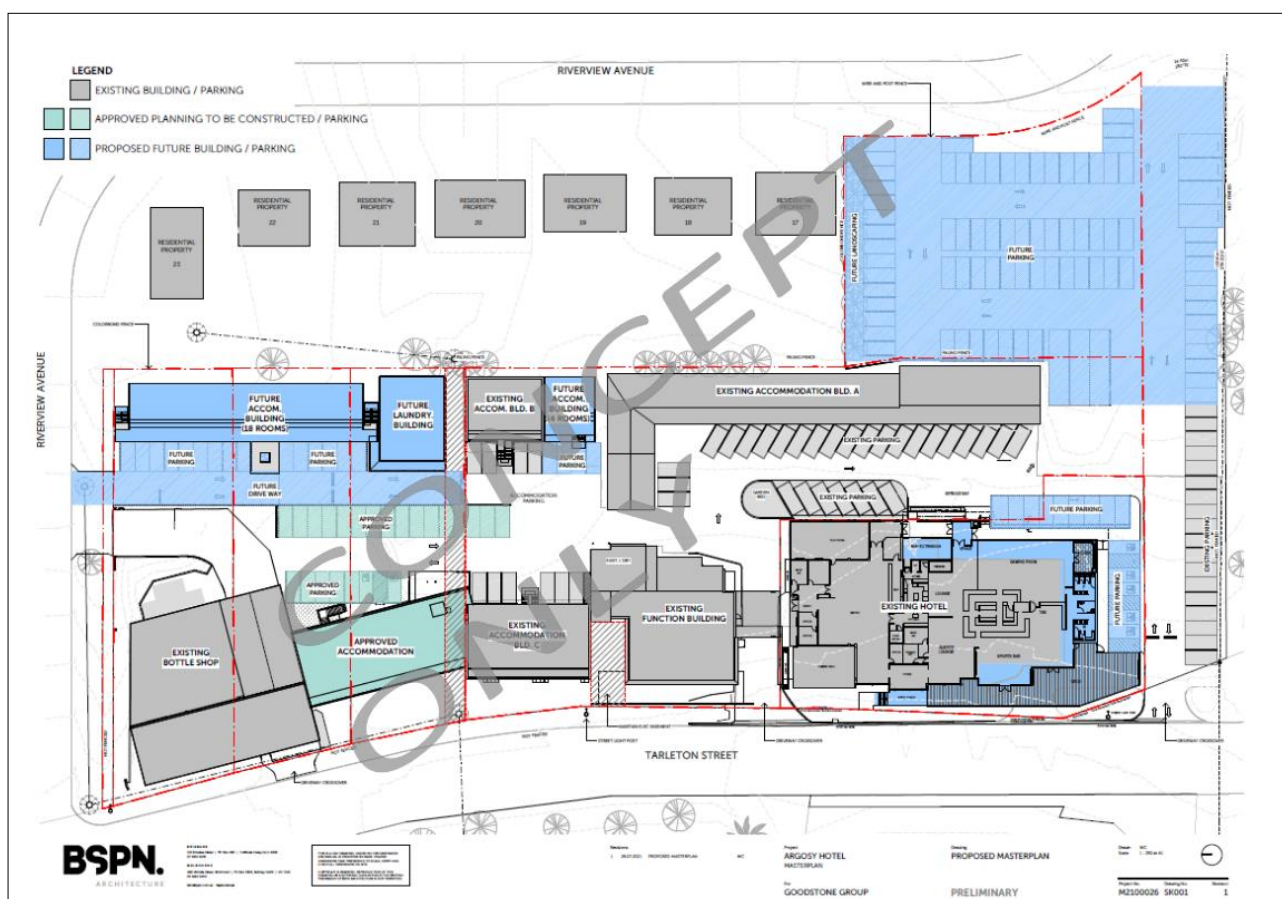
Argosy Hotel Masterplan (Equilibrium Town Planning, 2021)
